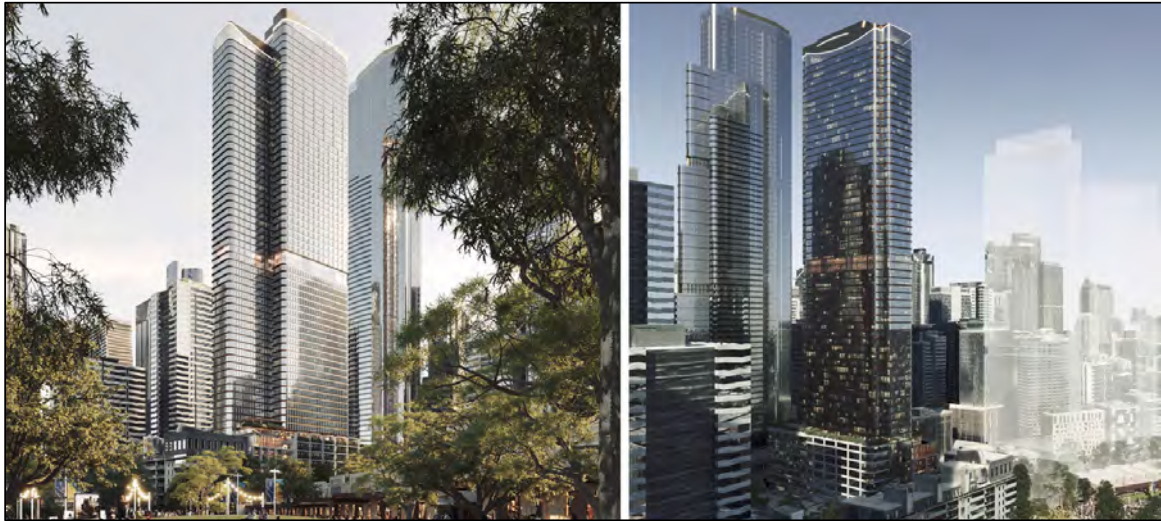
Render images of the proposed development from the north-west and north-east (Source: Applicant dated June 2025)
